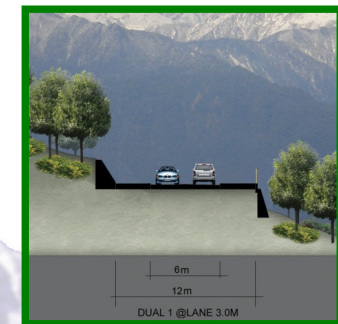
Proposed dual-1 road (3m) to be constructed
